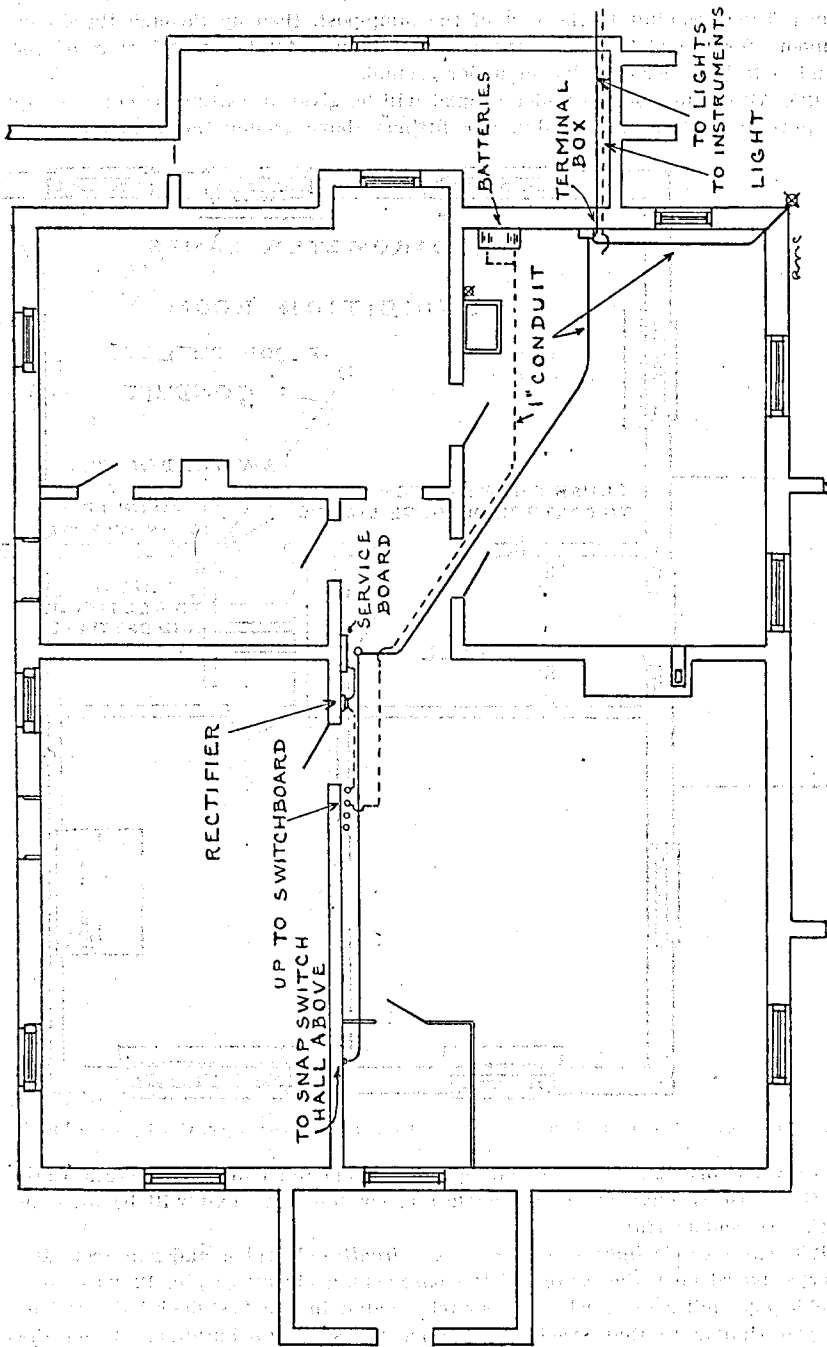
Basement plan showing electric-light and instrument conduits, Observatory, Cincinnati, Ohio.
